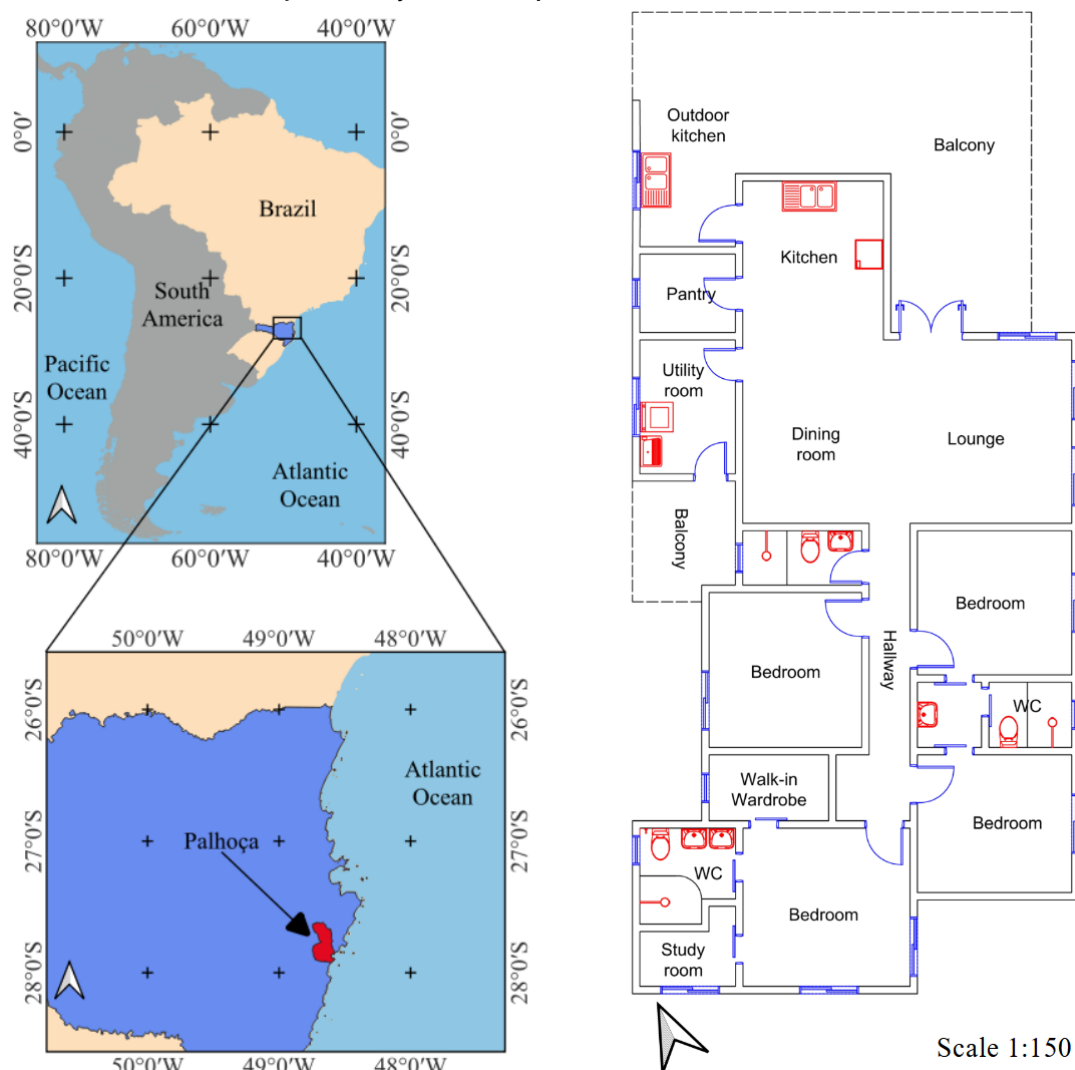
Location of the city of Palhoça and floor plan of the house considered herein
